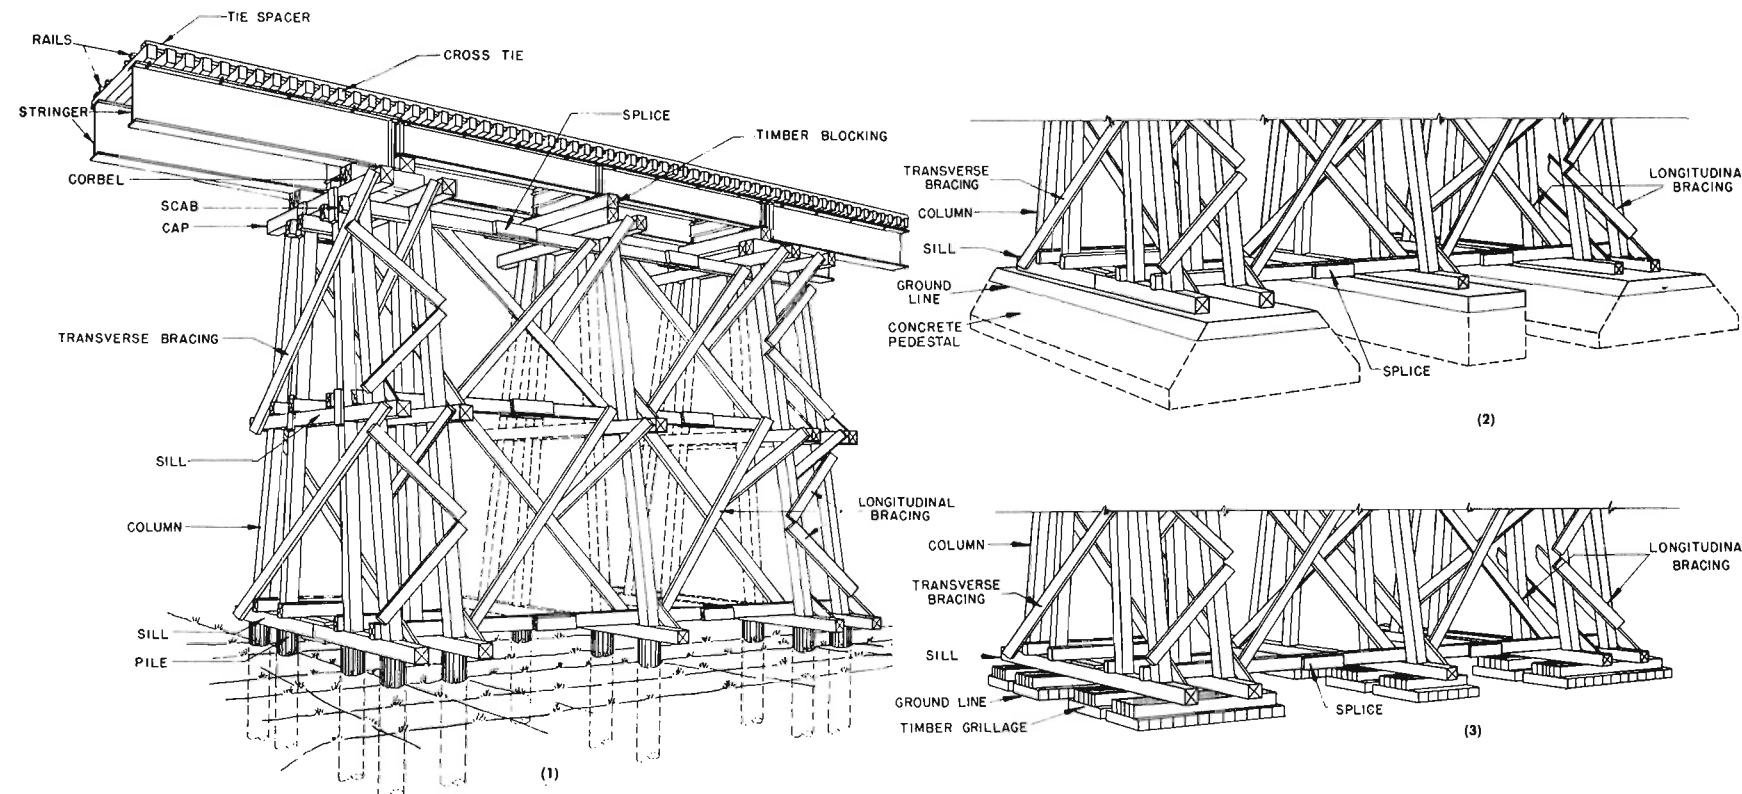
Railway bridge, steel stringer spans, framed timber tower.
